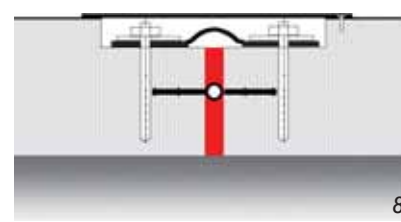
Waterproofing of a joint with an adhesive sealing system
